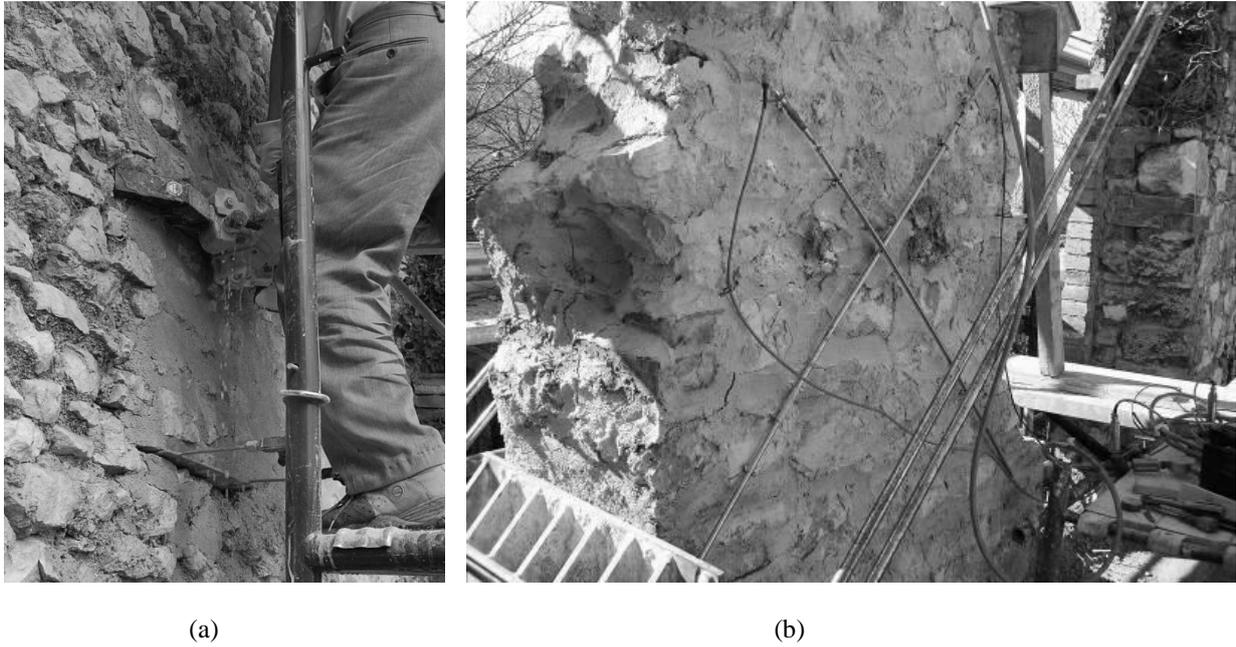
On-site testing on reinforced samples: a) flat jack testing, b) diagonal compression test.
